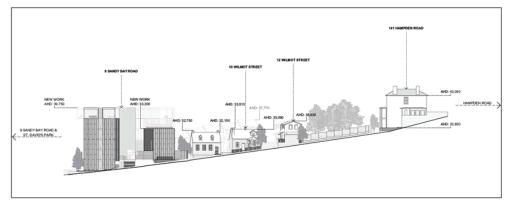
Streetscape along Wilmot Street indicating RLs (source: Room 11 Architects)
